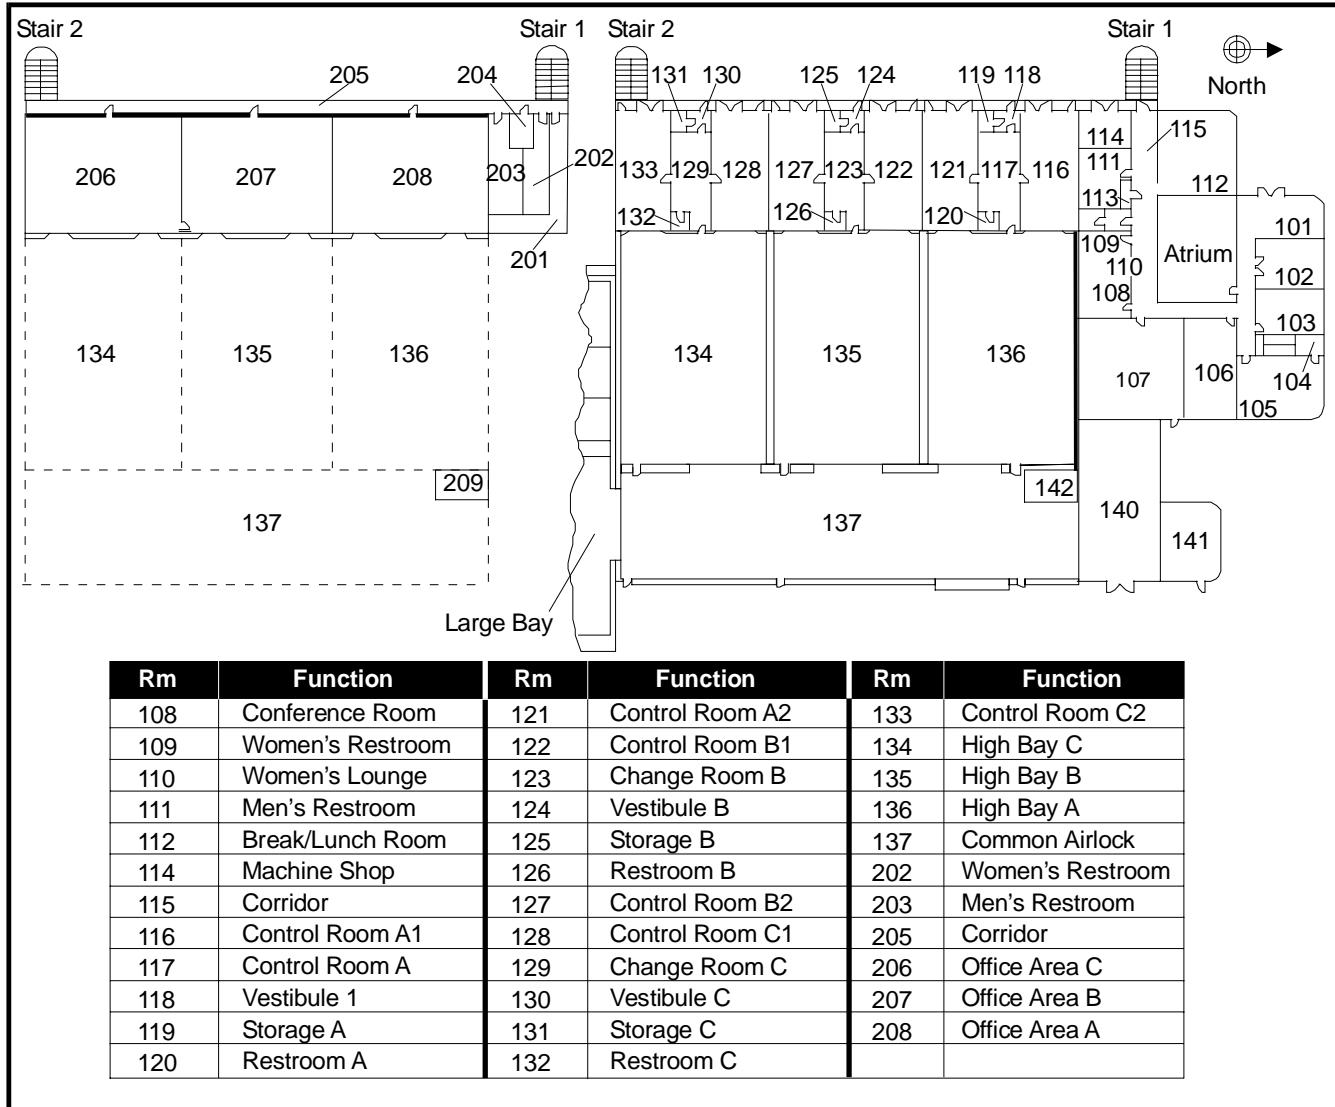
Astrotech Building 1 Detailed Floor Plan
